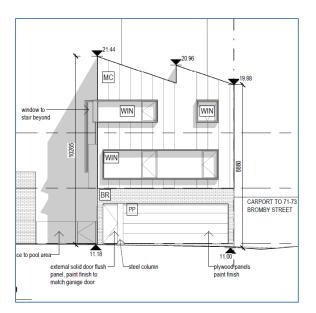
extract of the proposed east elevation studio plan (Source: applicant)
